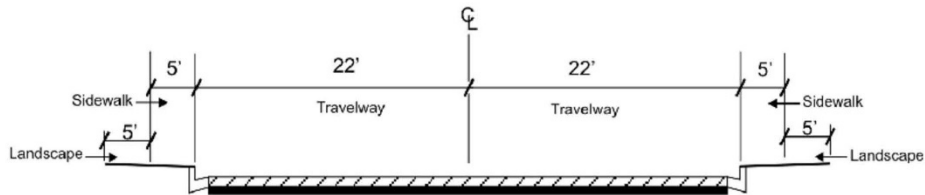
CITY OF CORONA GENERAL PLAN ROADWAY CROSS-SECTIONS (PAGE 2 OF 2)
